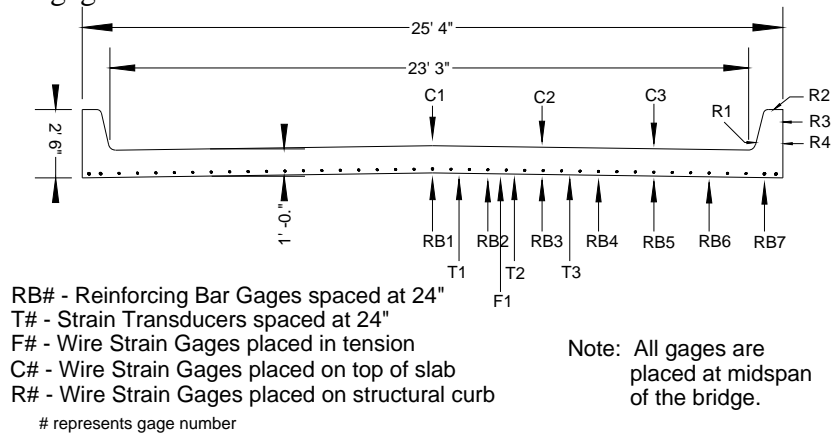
General Location and Type of Instrumentation Used for Bridge Test.
